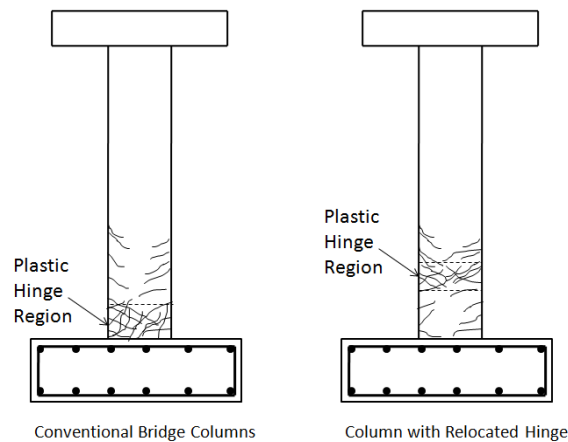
Hinge formation in a typical bridge column and a column with relocated hinge
